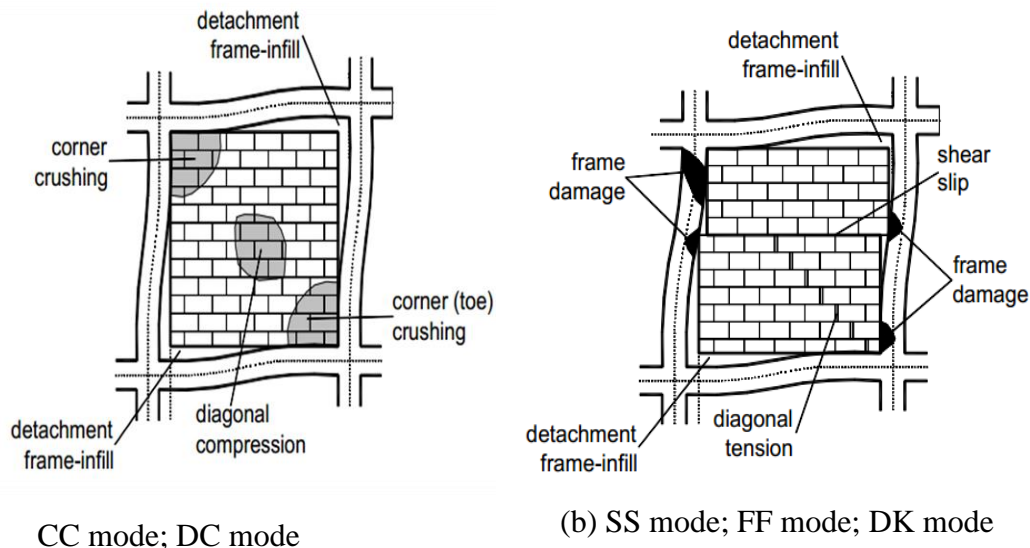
Different failure modes of infill wall (Asteris et al. 2011)
